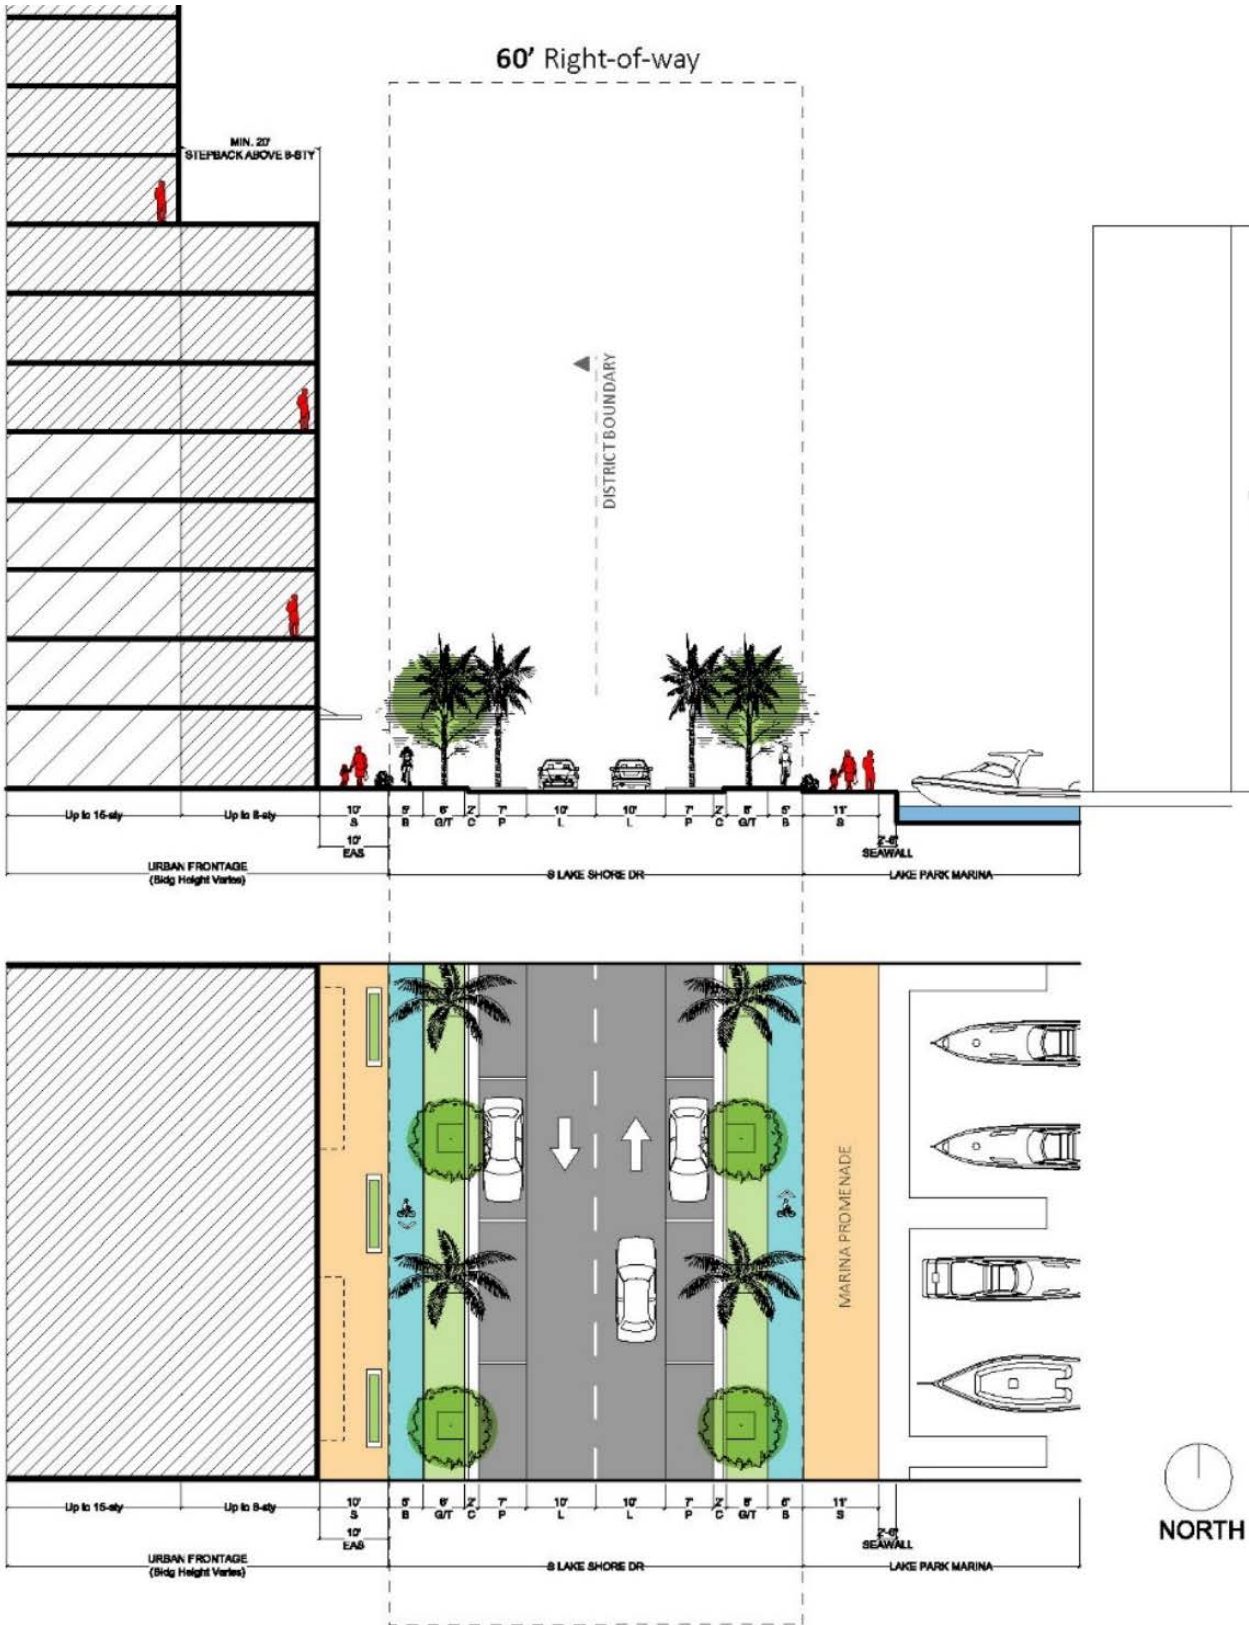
F.4: Lake Shore Drive (South of Date Palm Drive) Street Design
